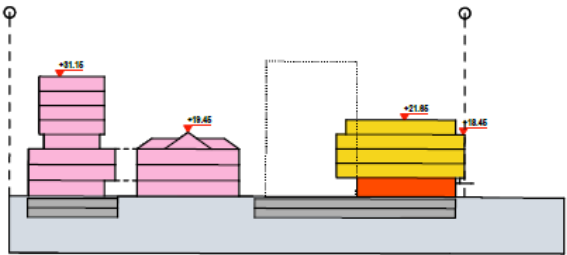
CONCEPT PLAN SECTIONS (SOURCE: ARCHITECTUS)
